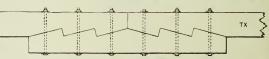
Indented Beams for Lengthening and Strengthening.
